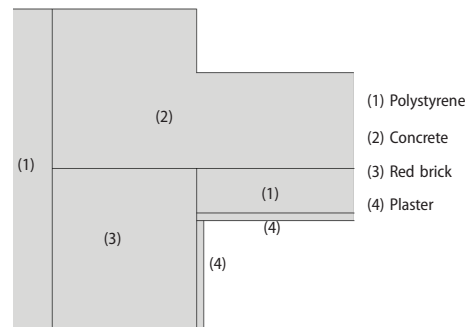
Composition of studied thermal bridge (vertical section through an exterior wall/floor deck intersection)
